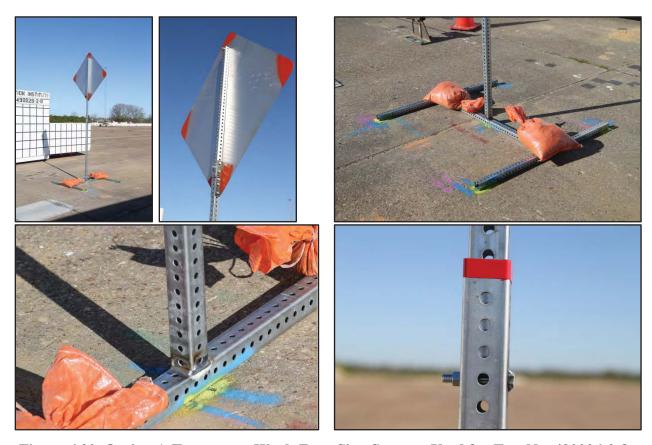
Option A Temporary Work Zone Sign Support Used for Test No. 490026-2-8.
